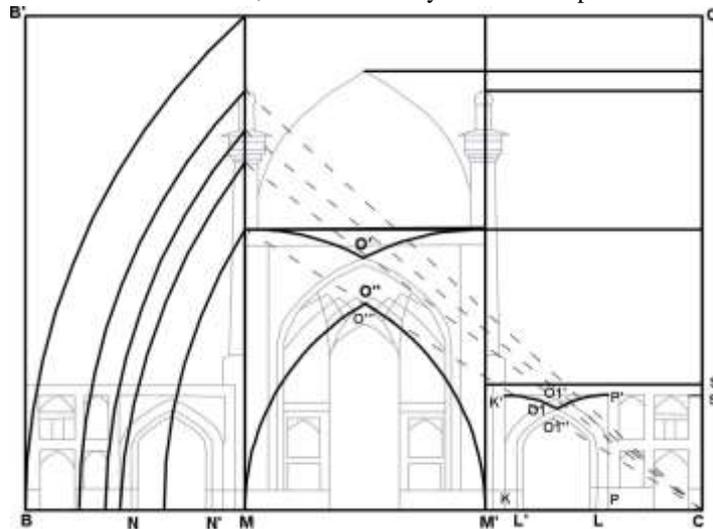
Geometric alignment of the plan with the elevation using common points from the plan.
